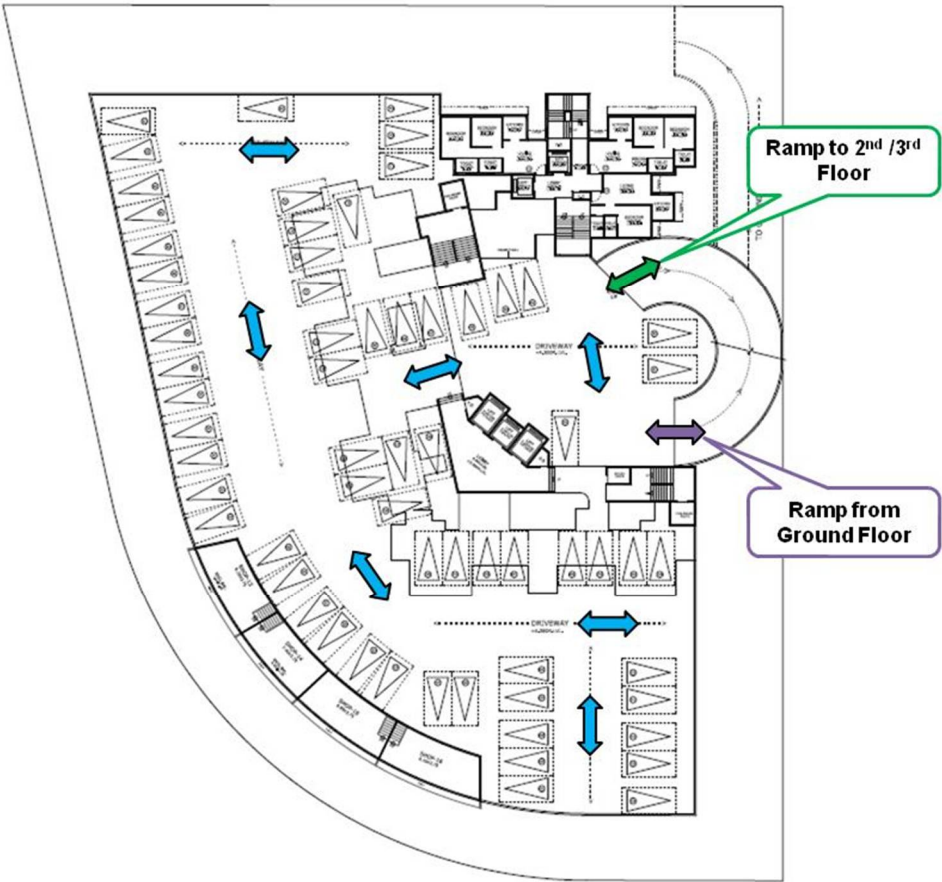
1<sup>st</sup> Floor Circulation Plan
